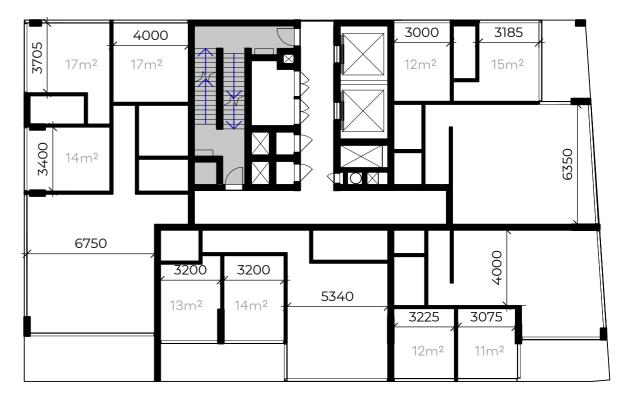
Building 2 Room Areas and Dimensions
